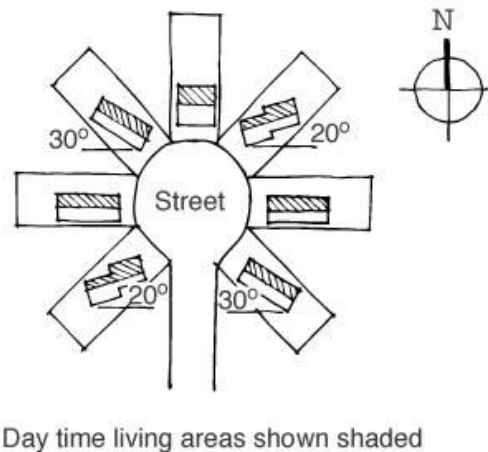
Where possible, orient the development such that daytime living areas and outdoor spaces are north-facing.
